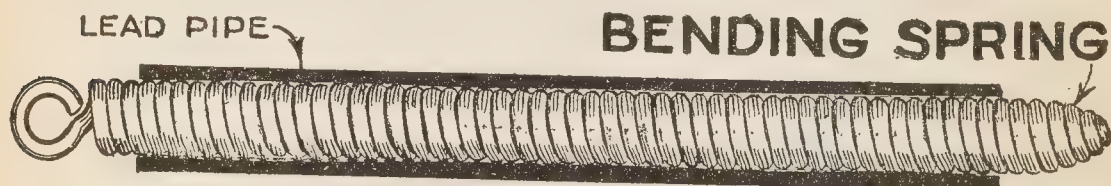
,509.—*Bending with spring, 1.* Bending spring in position inside the pipe forming an internal wall support which holds walls of pipe to shape in bending.
